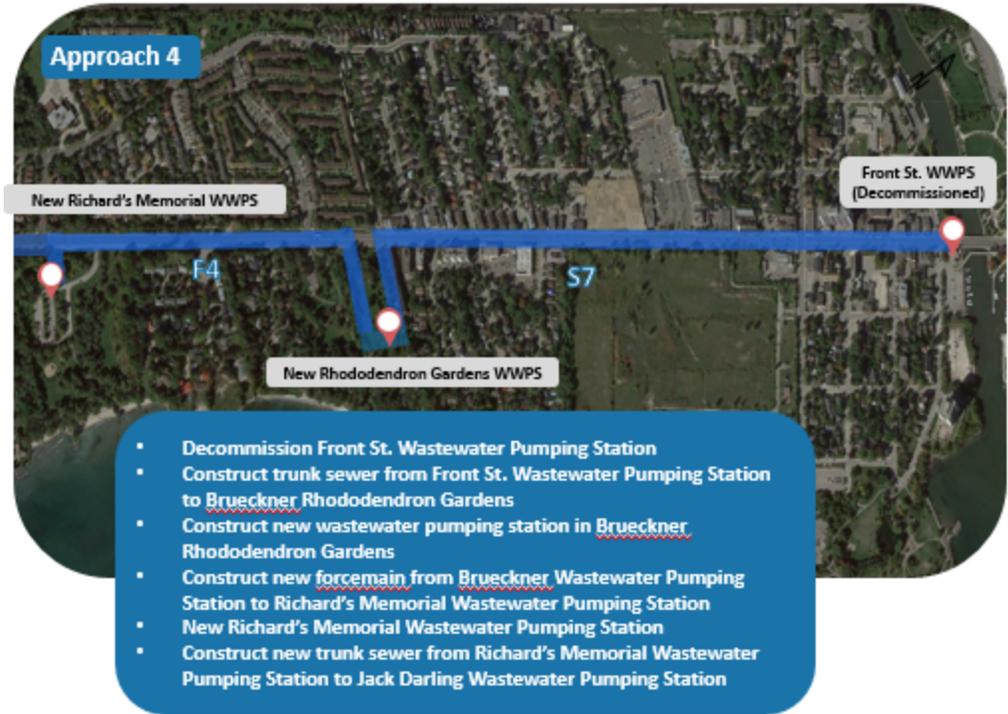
Redefined Approach 4 – Decommission Front St WWPS, Construct new sewer to New Rhododendron Gardens WWPS and Construct new Forcemain and Sewer to Jack Darling WWPS
